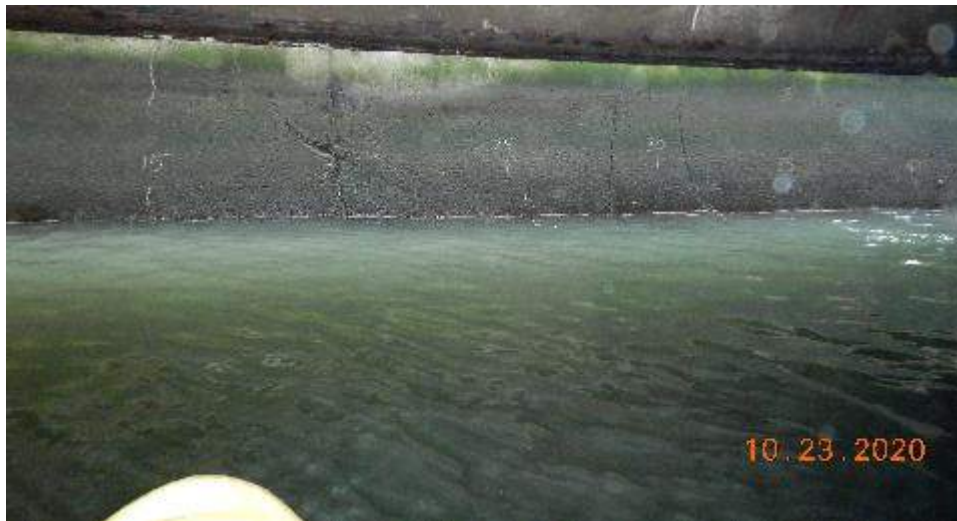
Concrete crack lines on South Surface, North Breakwater
